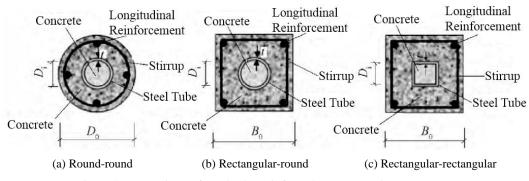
Cross sections of steel tube-reinforced concrete column structure
